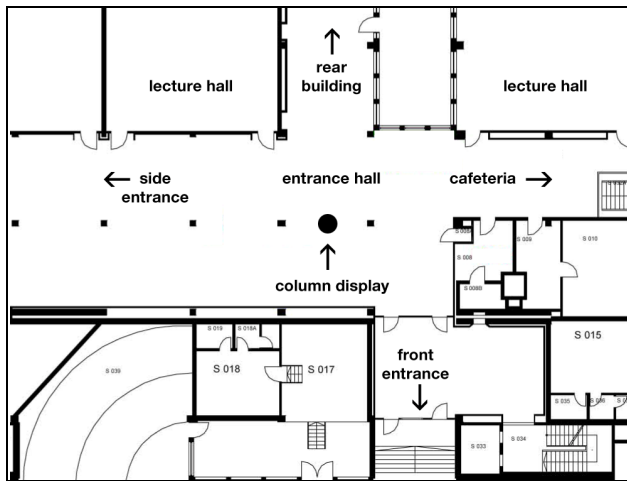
Floor plan of the deployment location for the column display. It was installed at a main intersection within the entrance hall of the building.
